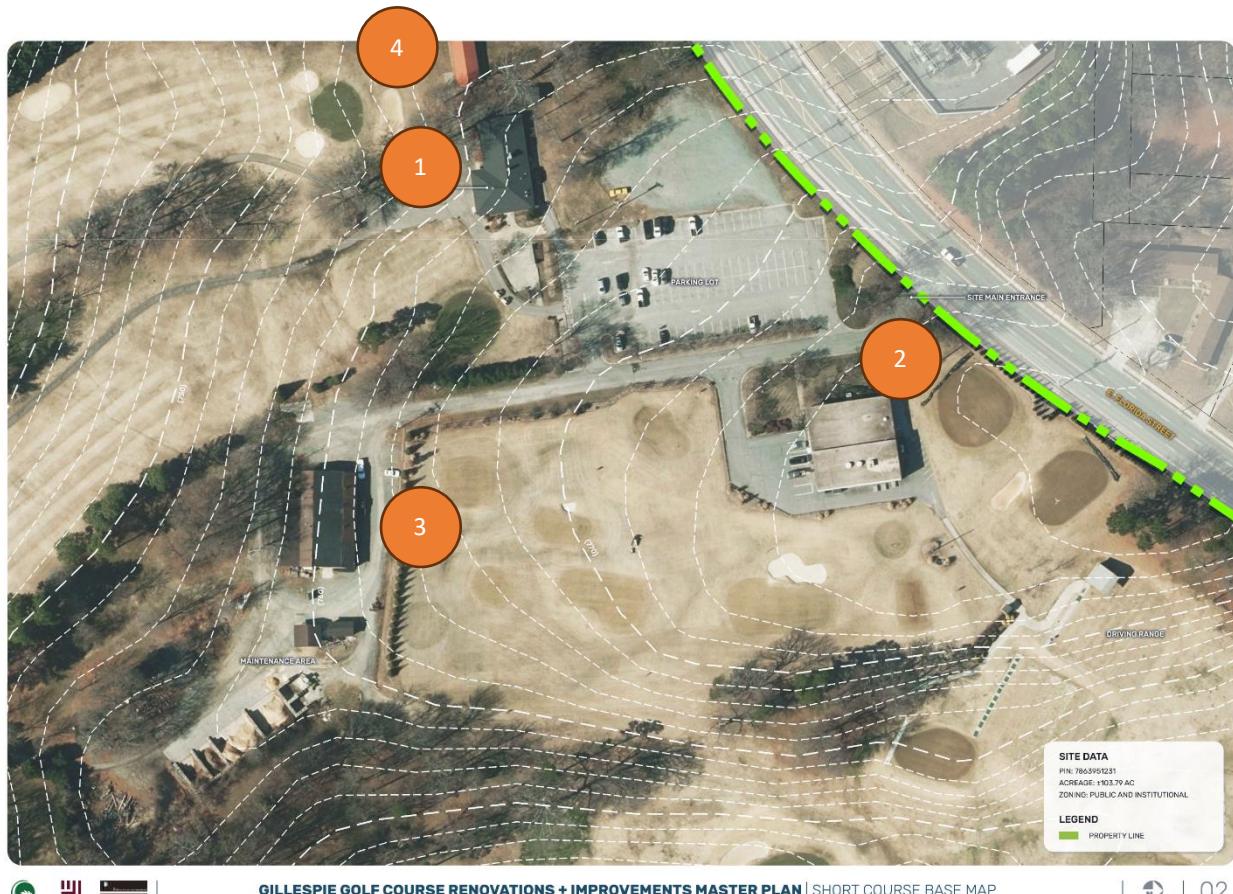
Existing Site Plan – Provided by McAdams 1) Clubhouse 2) 1st Tee Building (Old Maintenance Building) 3) Maintenance Building 4) Picnic Shelter
